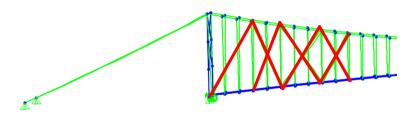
Vertical Bracing Pattern at Ends of 50 m Span Footbridge
